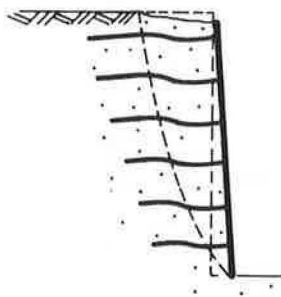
Failure of nailed soil mass during excavation.
